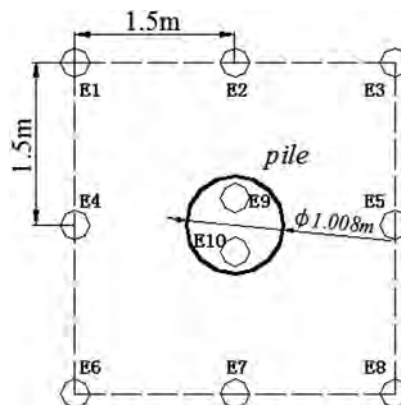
Layout of earth pressure cells of the embankment case of the Shanghai Railway. Drawing modified after Liu et al., 2007 [2].
